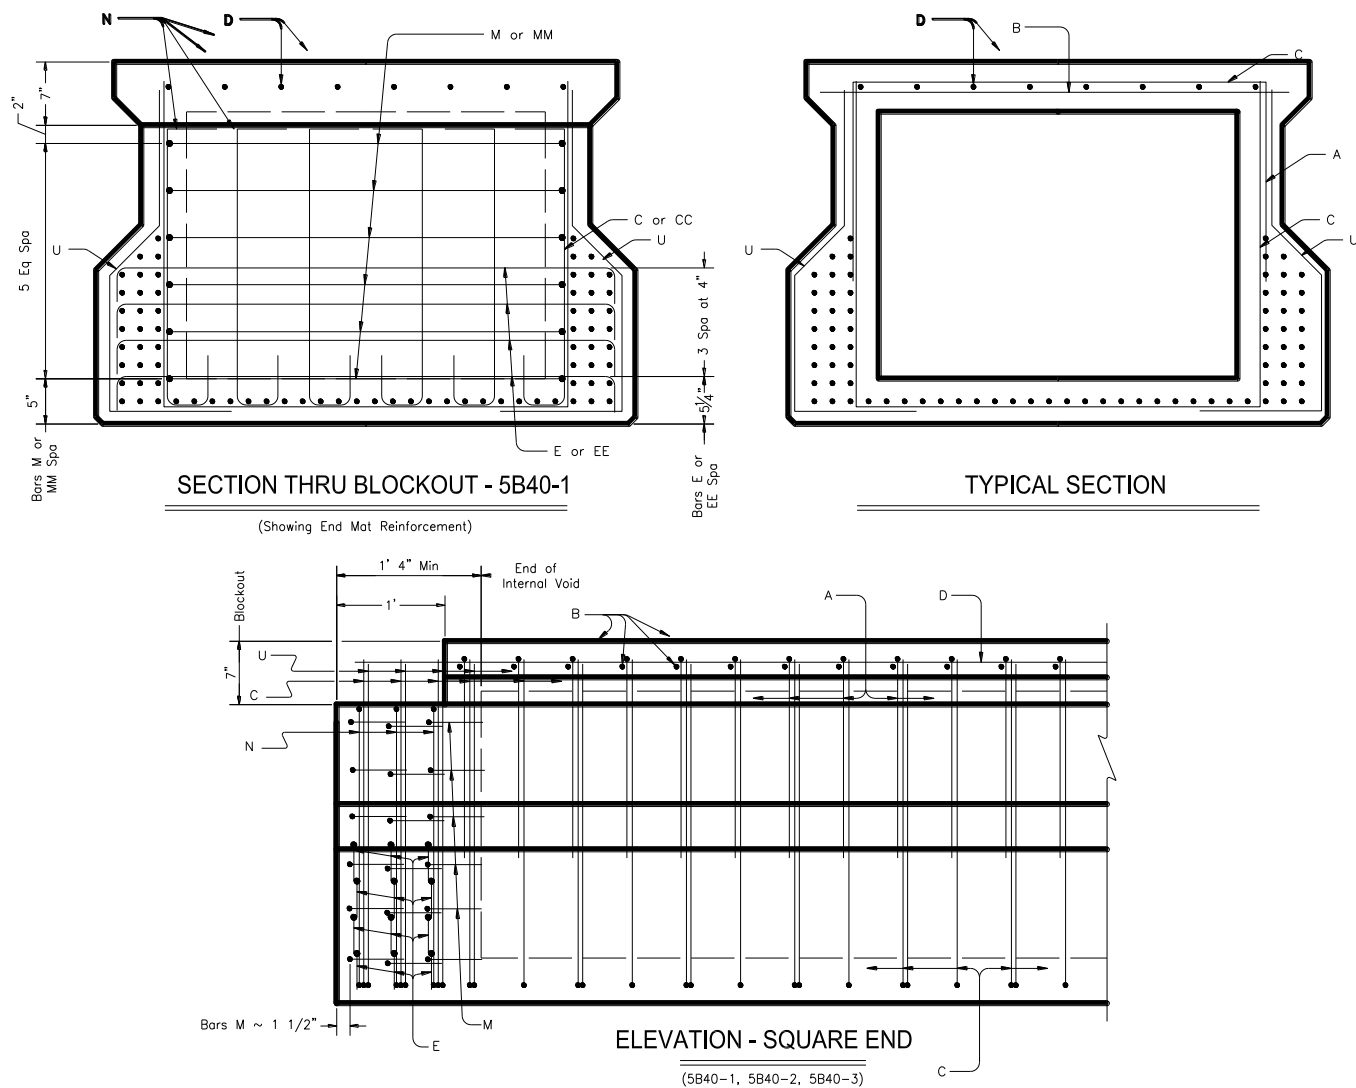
Cross sections and elevations. Beams 5B40-1, 5B40-2 and 5B40-3
